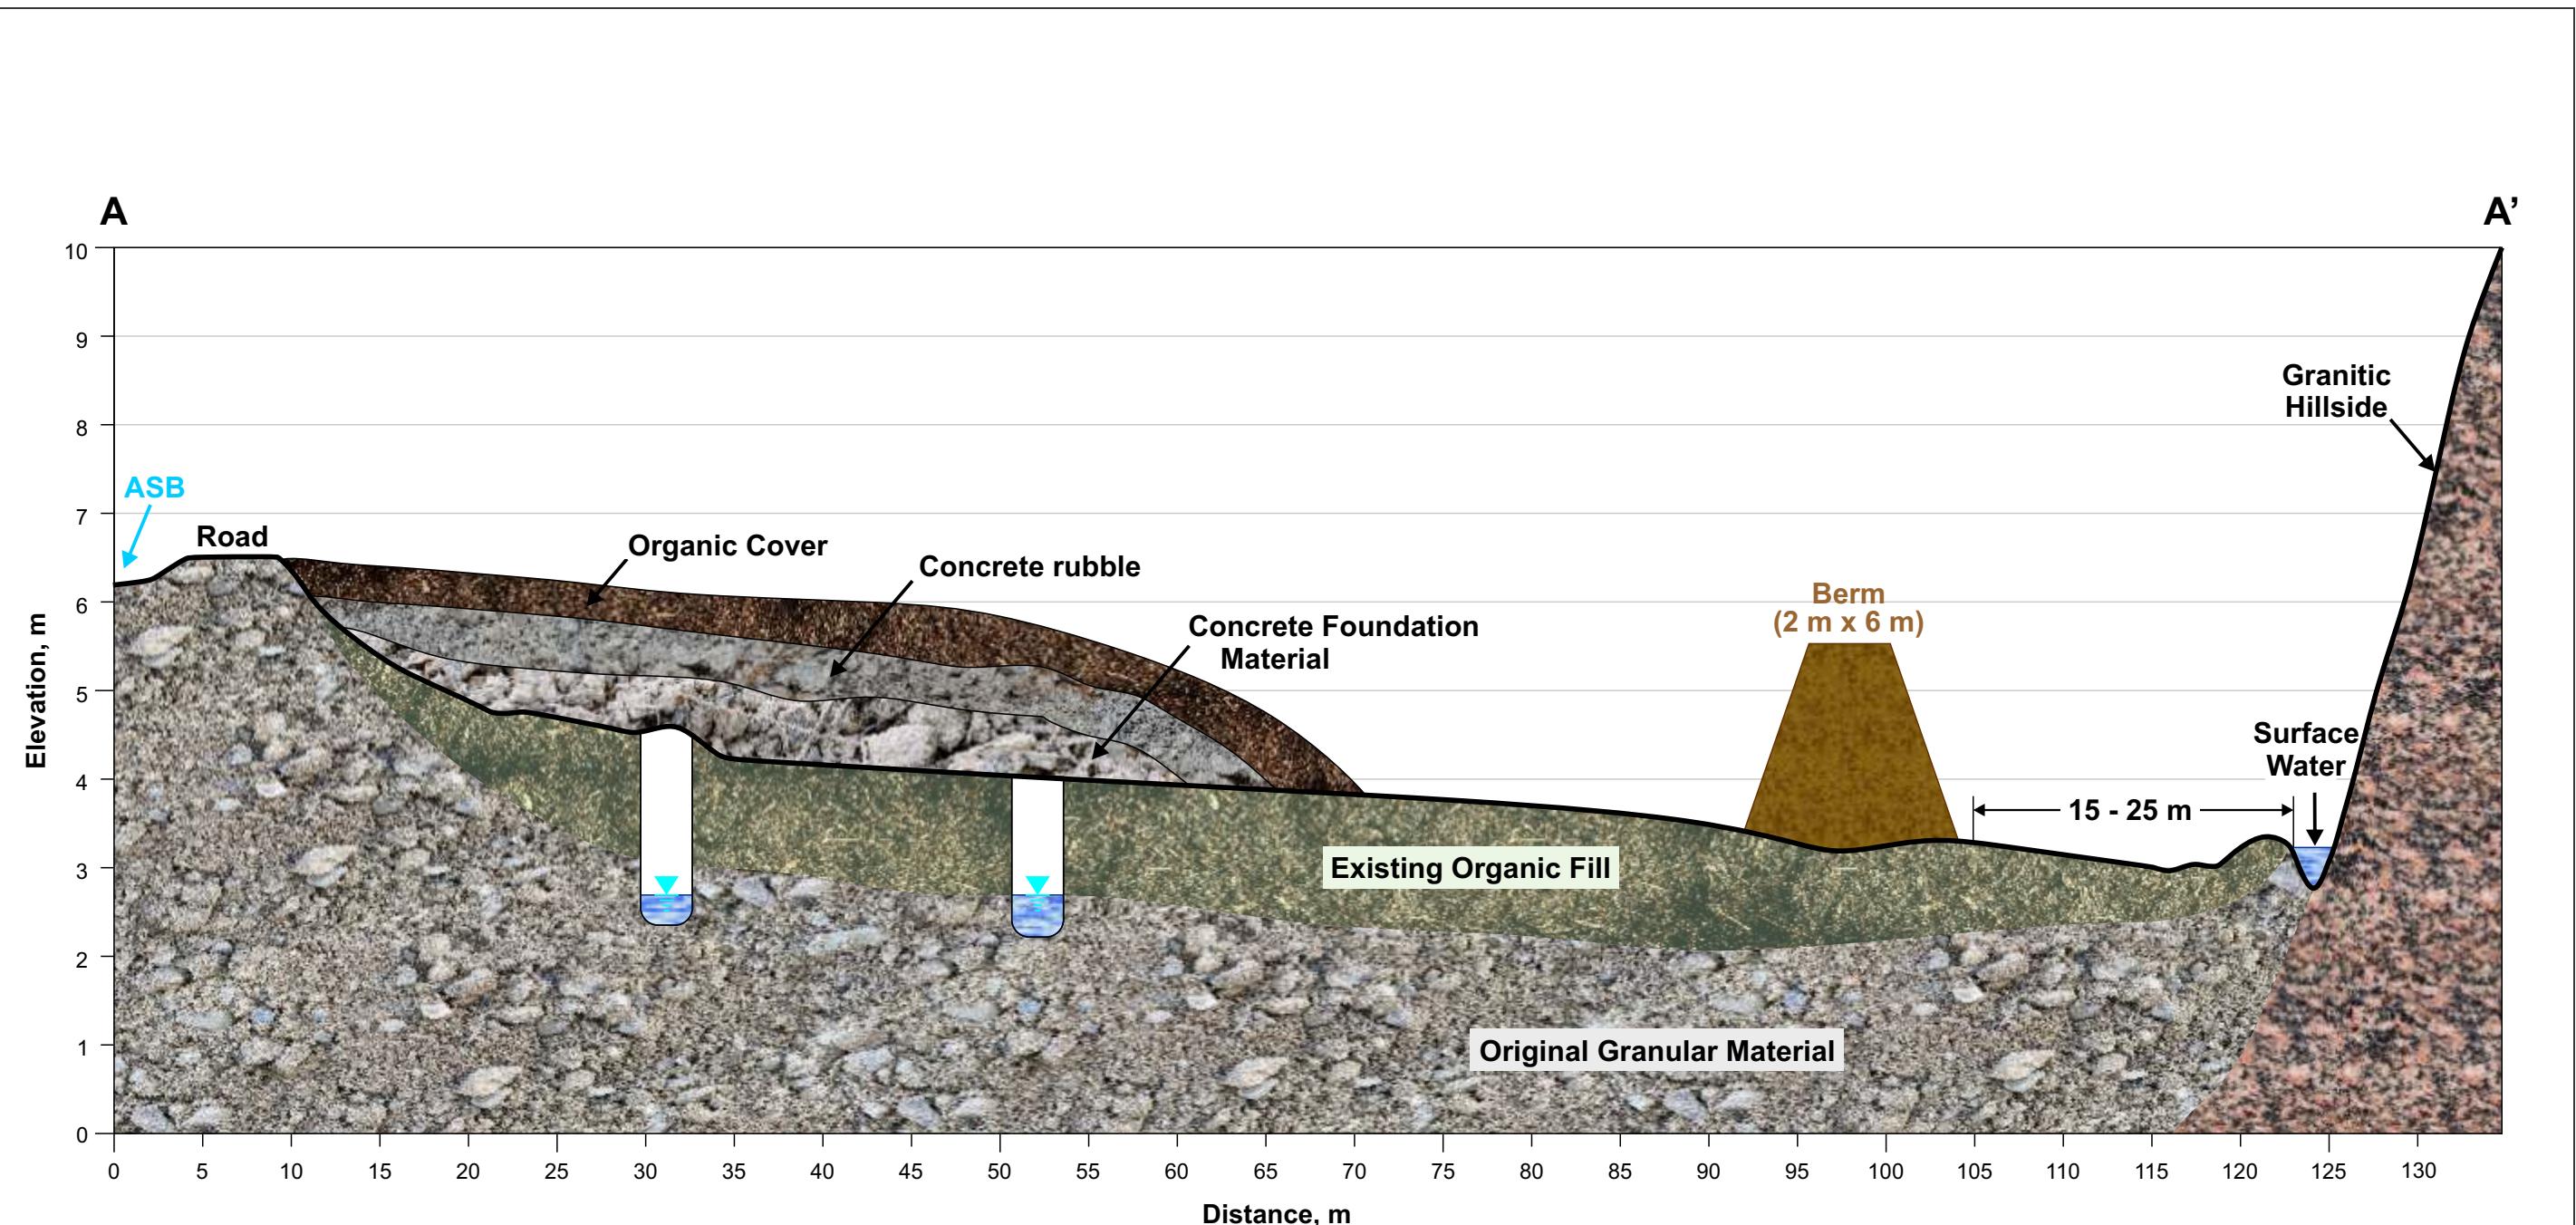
Schematic showing general slope and layered placement of concrete blocks from plant foundation, overlain by a layer of concrete rubble, which in turn is overlain by old organic materials from site.
